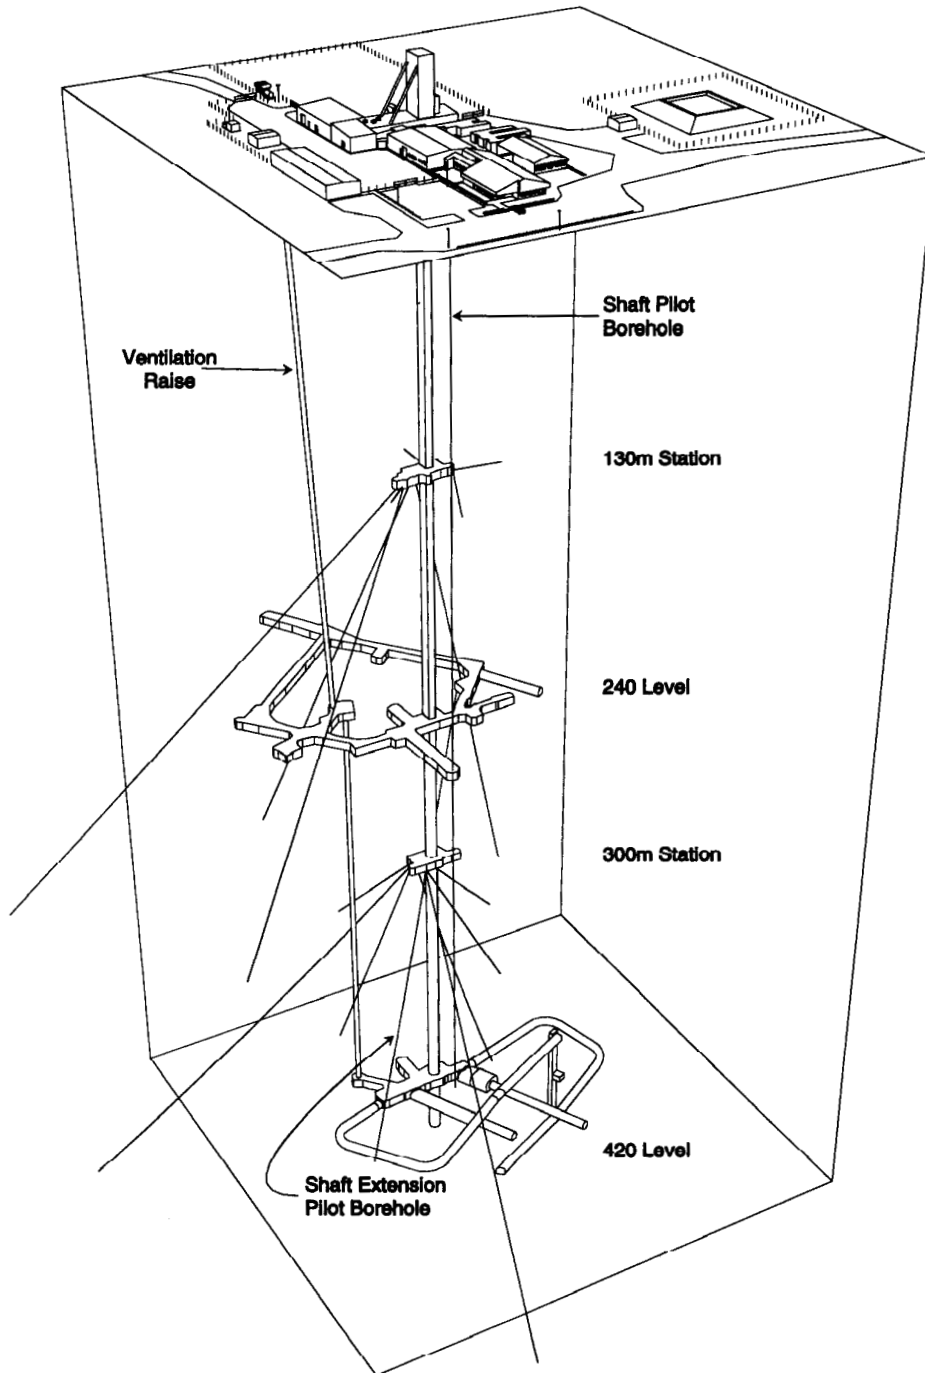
Layout of Boreholes Drilled From the Underground Research Laboratory Shaft Stations
